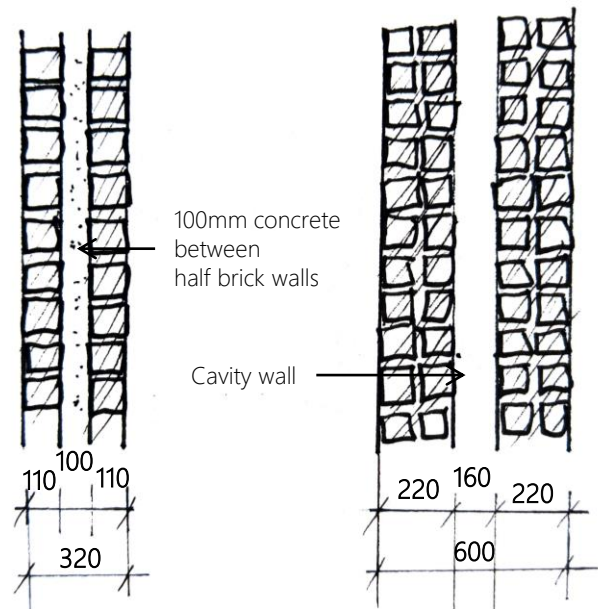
320mm and 600mm cavity wall sections (Author, 2022).
